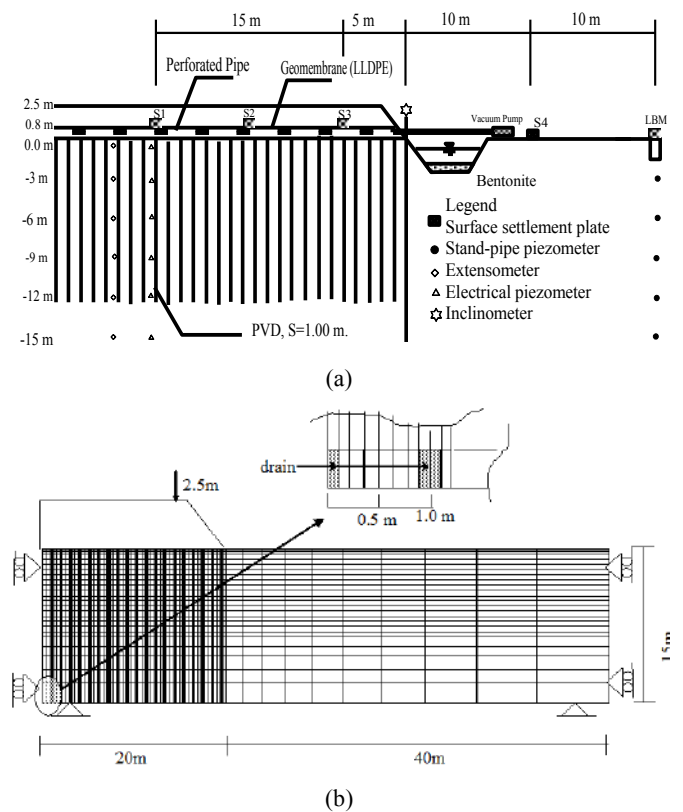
(a) Cross section of an embankment with profile of the subsoil and (b) finite element discretisation of the foundation of the embankment (Indraratna et al., 2004)
